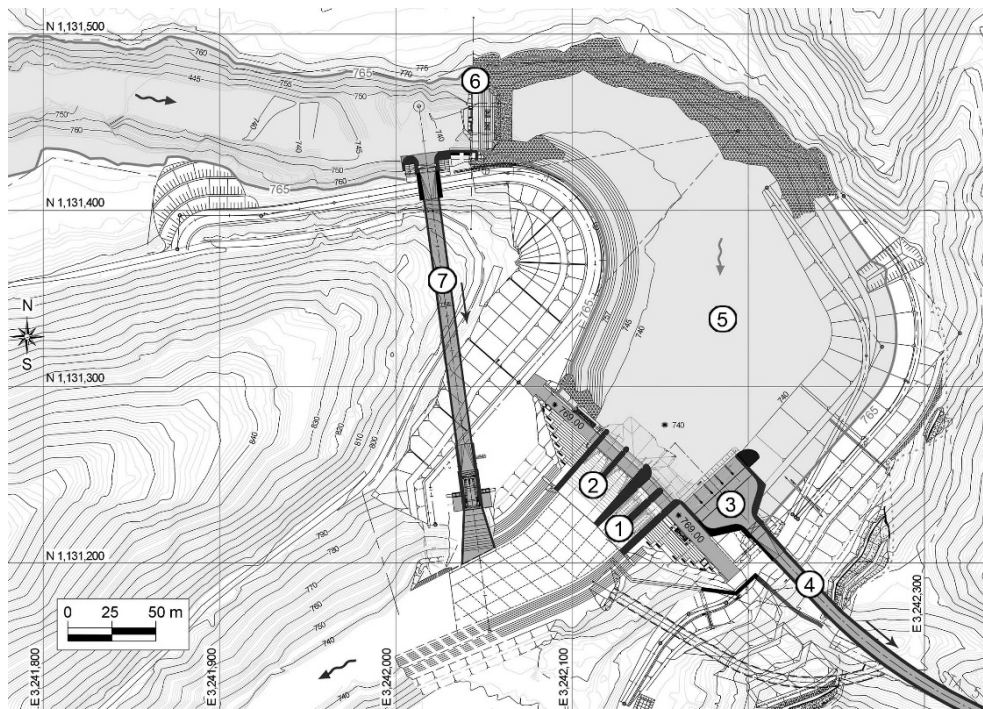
Plan view of the Patrind HPP dam site featuring the underflow spillways ①, the overflow spillways ②, the power intake ③, the headrace tunnel ④, the natural settling basin ⑤, the cofferdam ⑥ and the sediment bypass tunnel ⑦ (from Beck *et al.* 2016).
